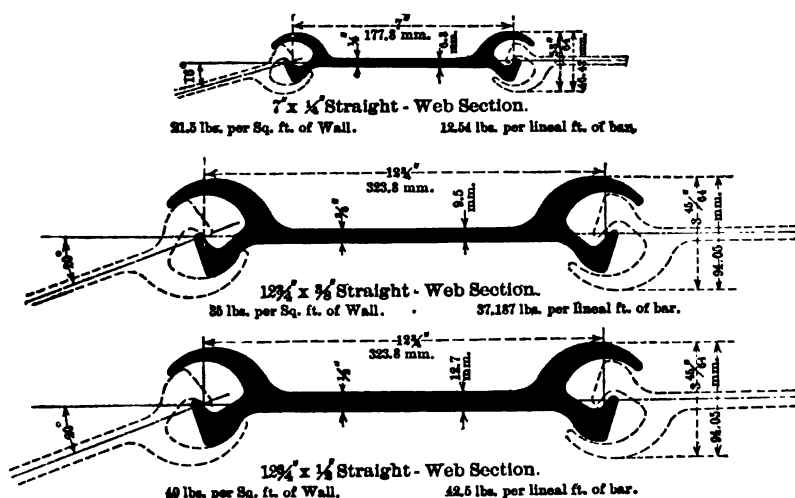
LACKAWANNA STEEL SHEET PILING.
